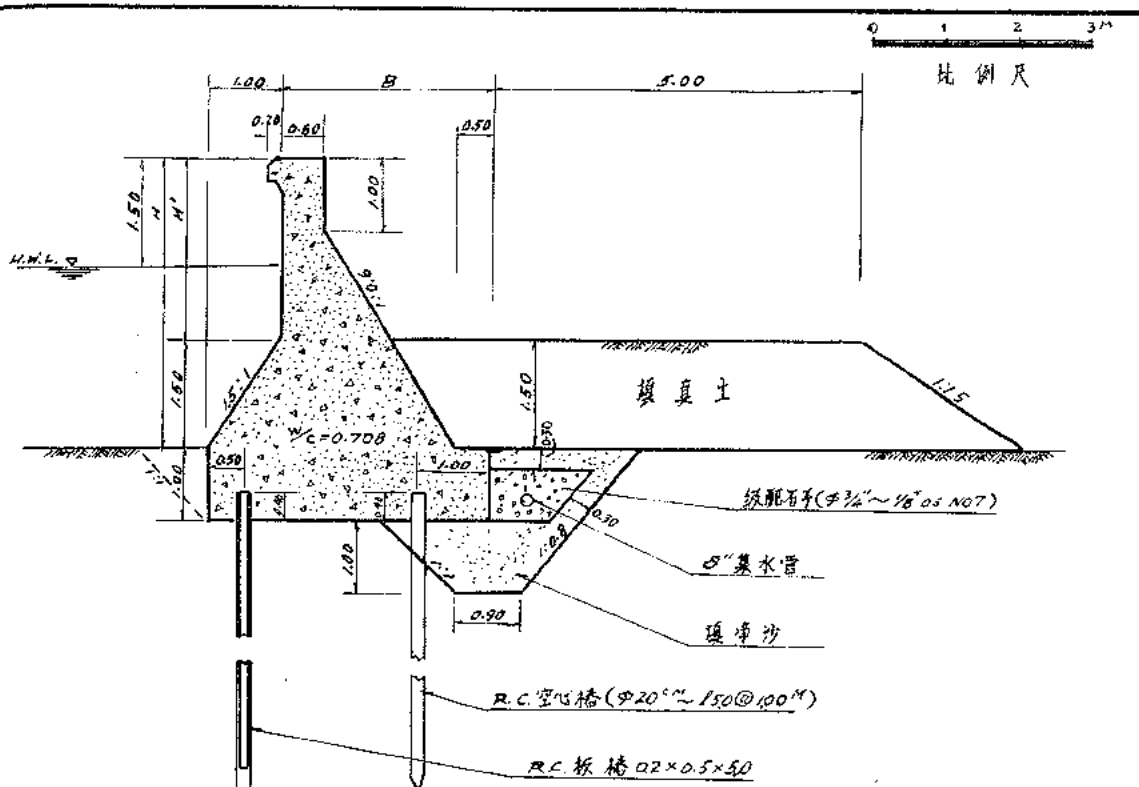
TYPICAL SECTION OF SANDY GRAVEL LEVEE
